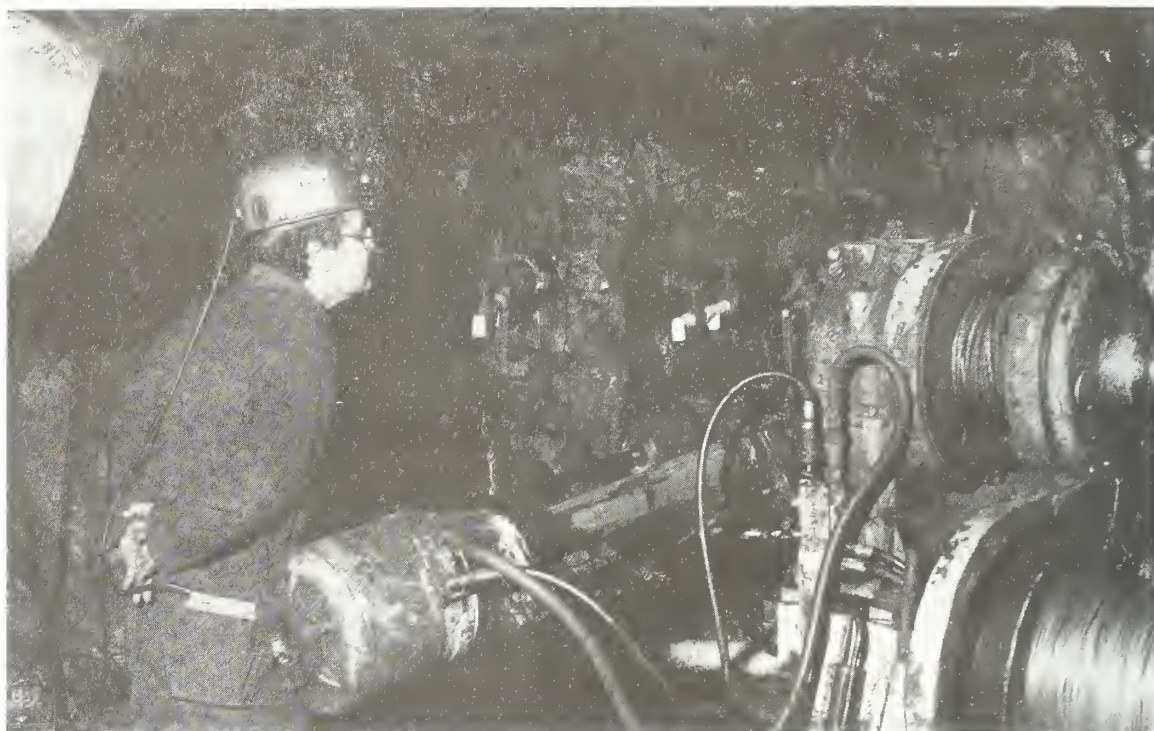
Electrohydrostatic drill was used to bore lateral collection wells and north wall of main room. Note spigots attached to wall, air intake in upper corner, and oil and water seeping through walls. Photos by Joel Dexter
